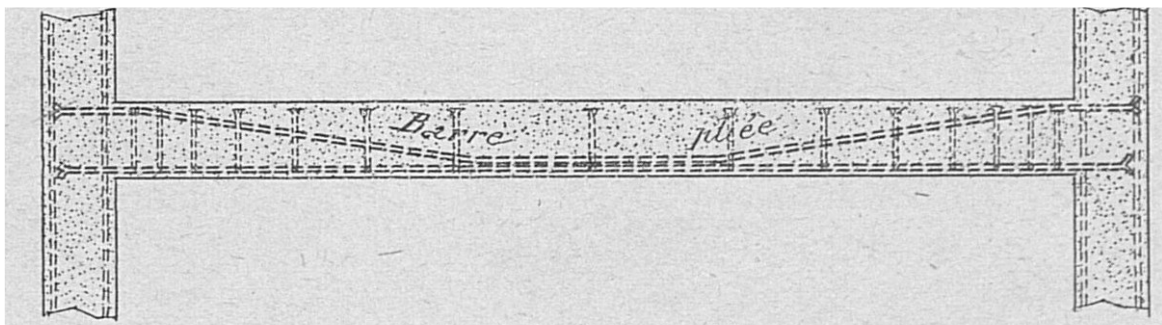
Section of *béton armé* system beam with bent-up rebars in 1895. (*L'Architecture*, 1895, 46, p.389)
